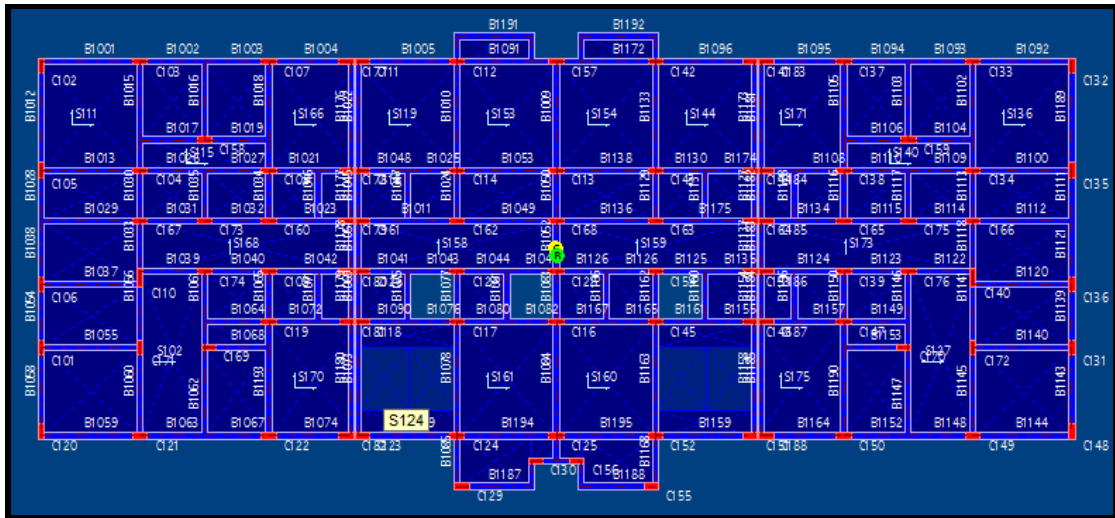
Plan of Five Stories with Flat Slab-Beam System
